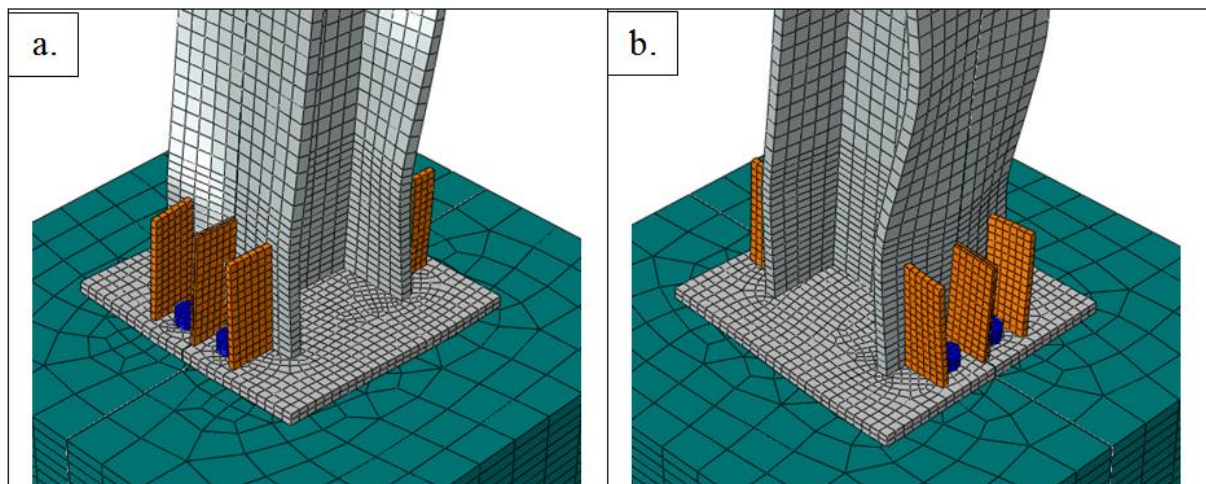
Deformation of model 2. a) Tensile flange, b) Compressive flange
